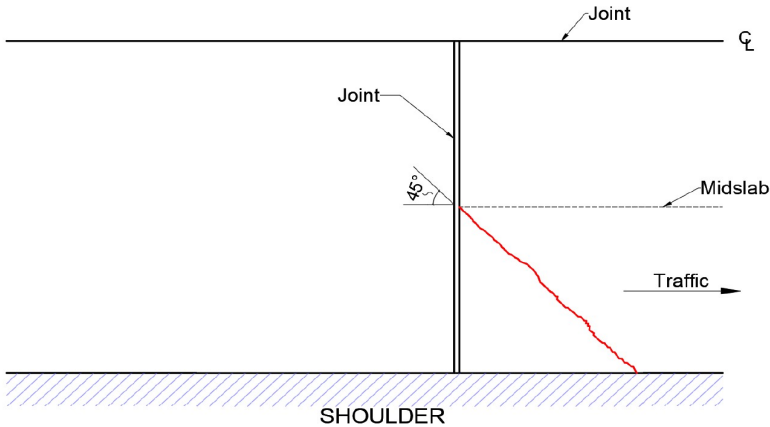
An illustration of corner cracking redrawn from Miller et al. (2014).
